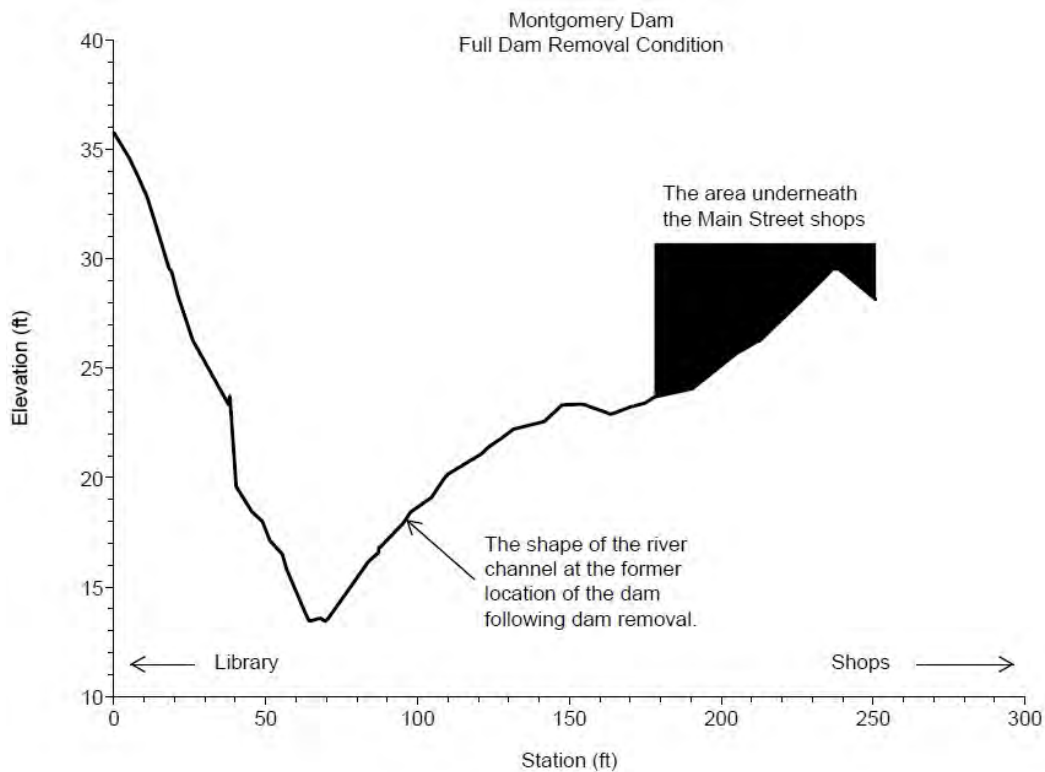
Dam Geometry, Dam Removal, looking downstream.
